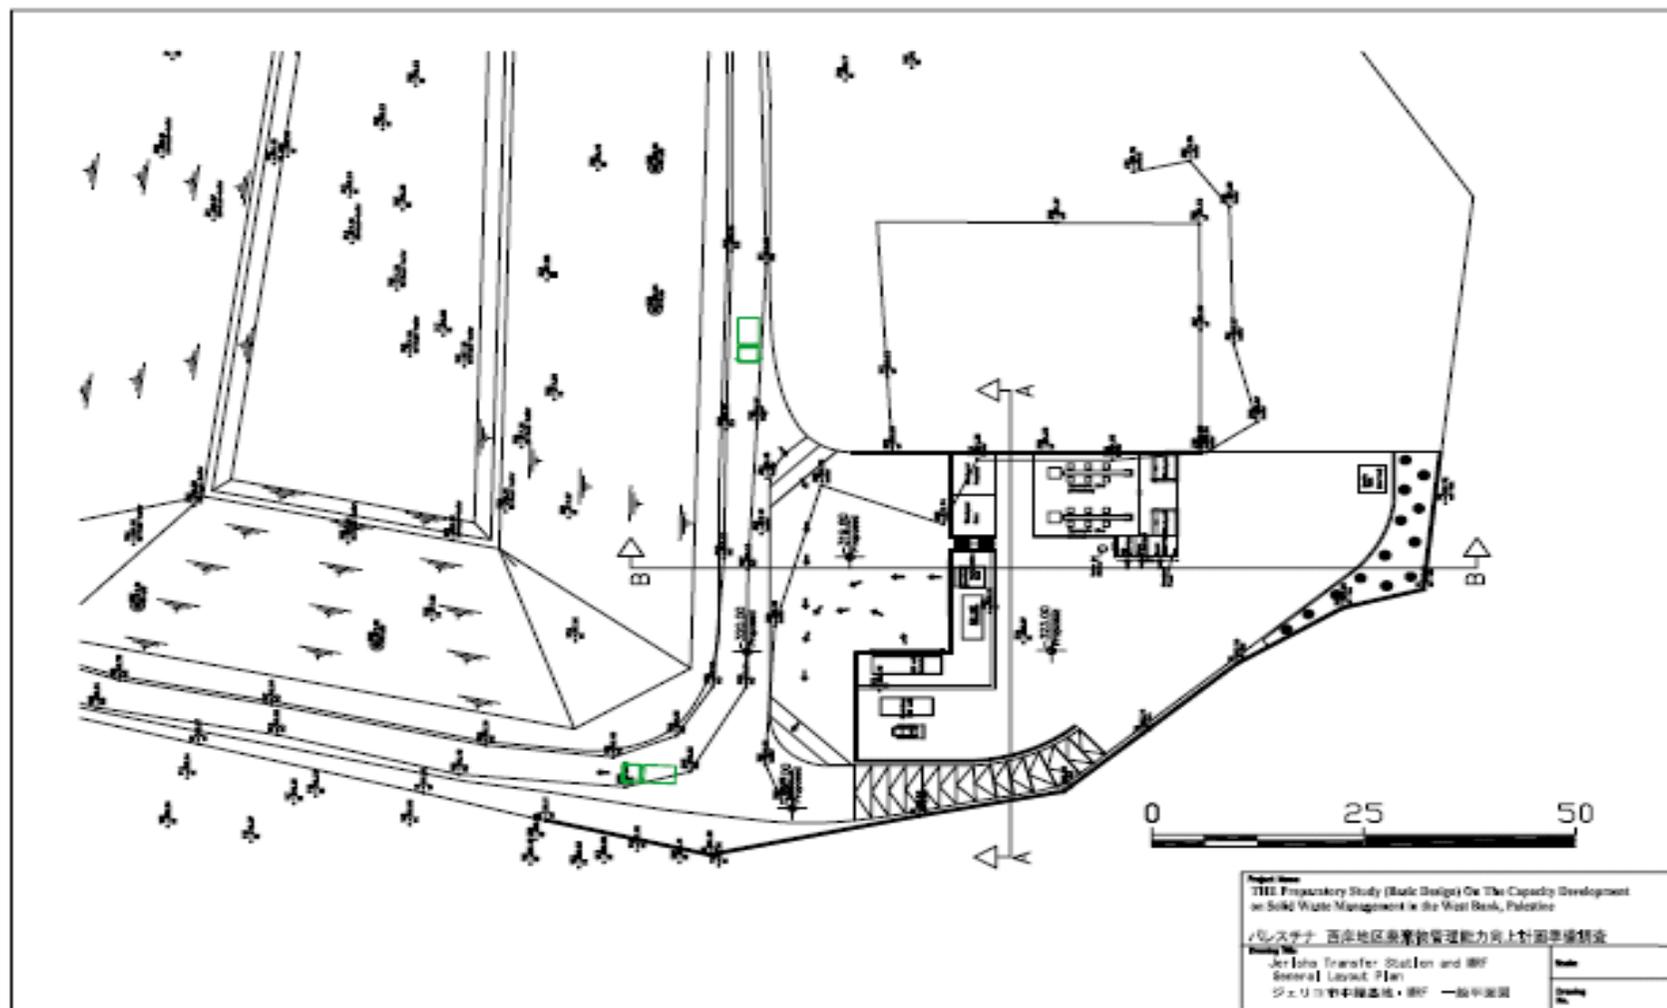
Transfer Station and Material Recovery Facilities (MRF) (Jericho JC) - Plan
